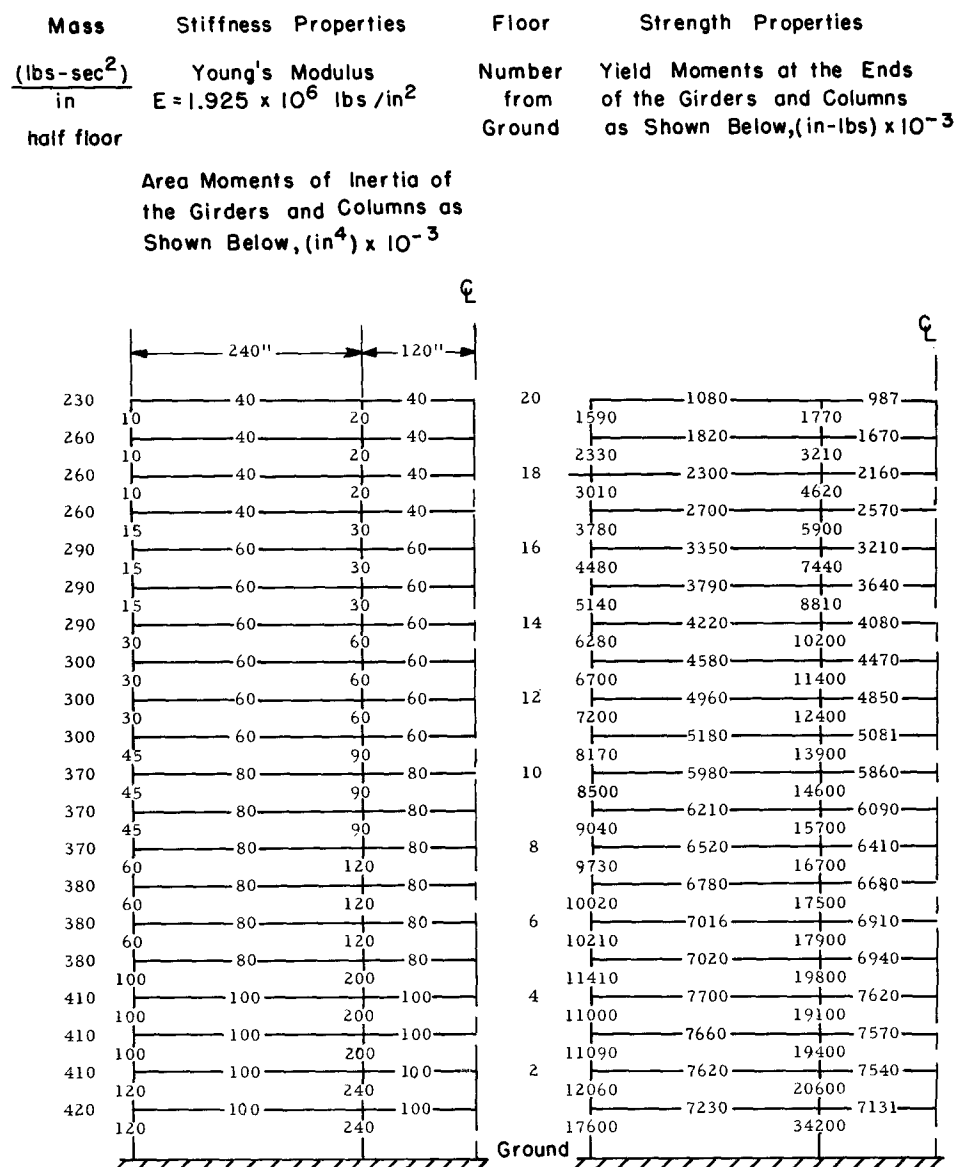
The structural parameters of the frame. Only half of the frame is shown since it is symmetric with respect to the center line (see Fig. 1b). The height between floors is 144 inches except between ground and the first floor where it is 180 inches.
